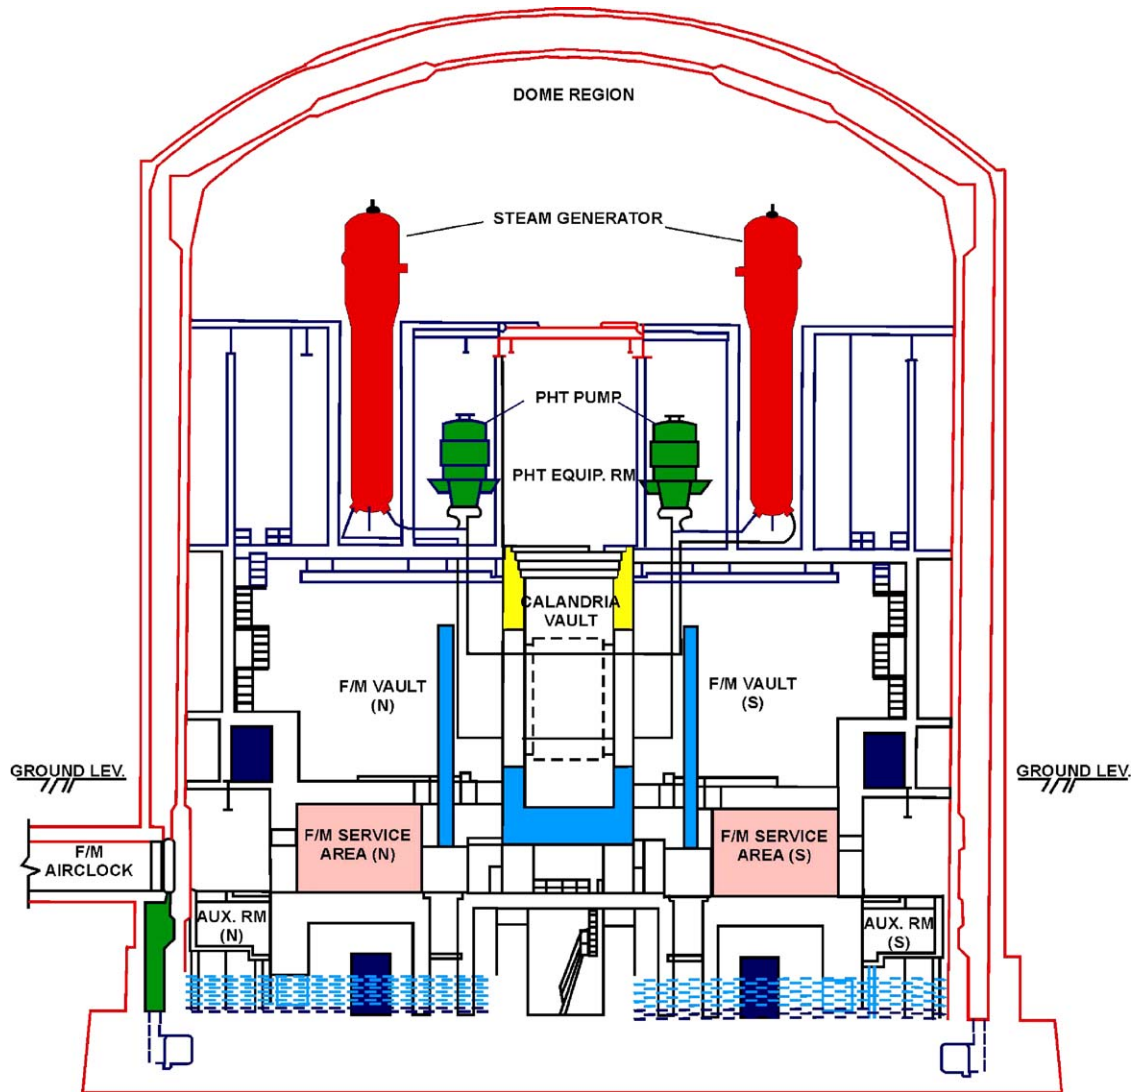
Schematic on 540 MW_e PHWR containment (RB sections).
